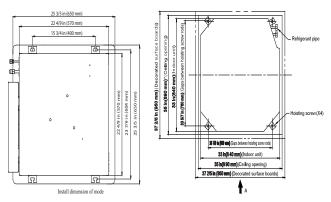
Dimension of ceiling opening and location of the hoisting screw (M10)
